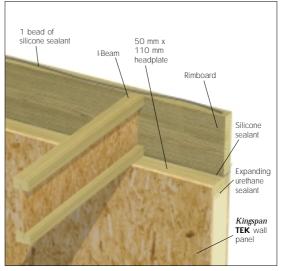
LOCATING AND FIXING RIMBOARDS FOR FIRST FLOOR DECK
